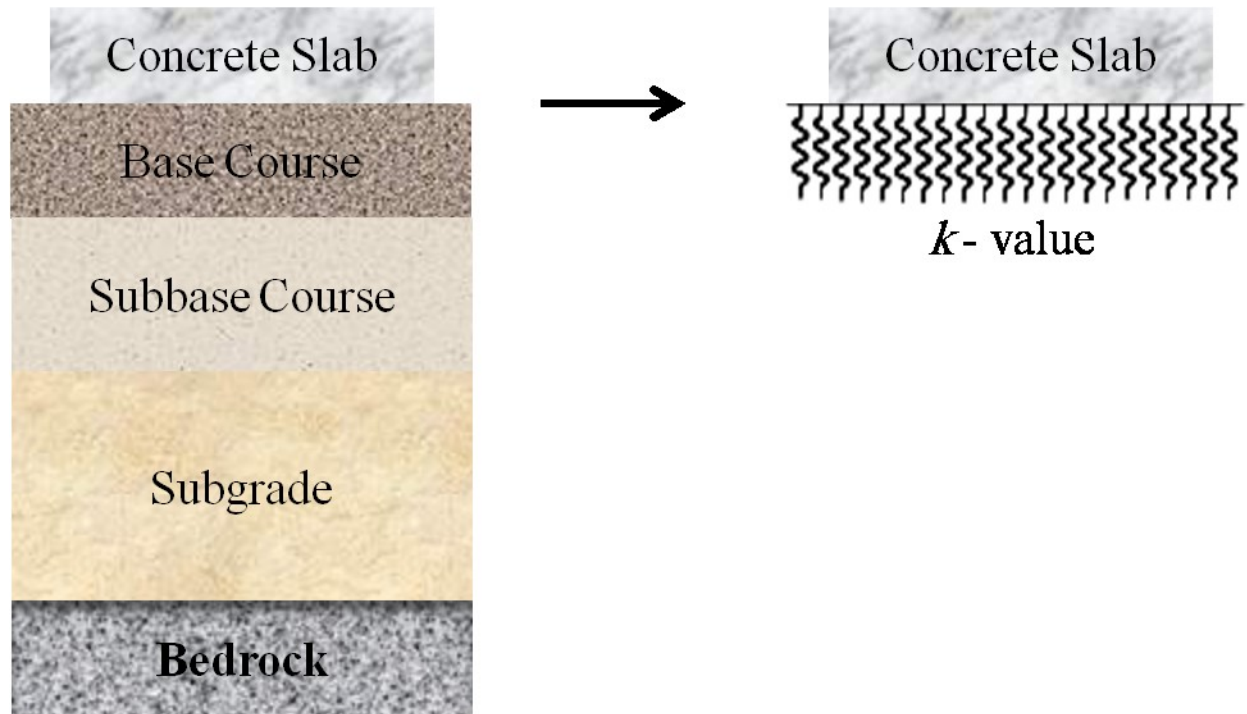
Idealizing of foundation system as a Winkler model in NYSLAB
